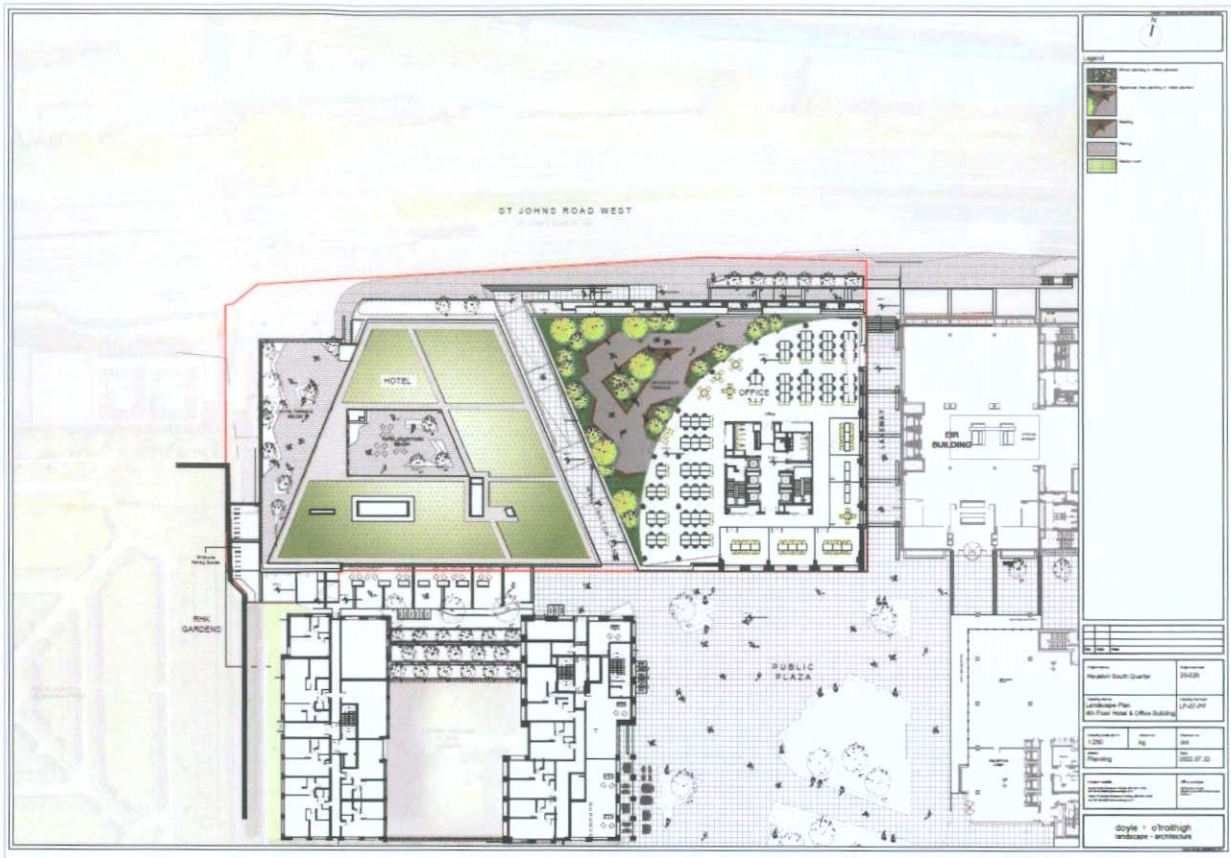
Landscape Plan Roof Garden Level (Doyle O’Troithigh Landscape Architects)
